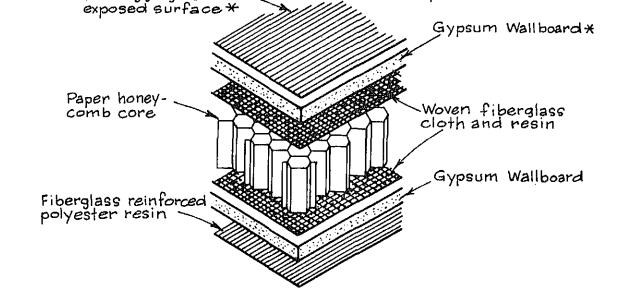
HONEYCOMB CORE PANEL WITH GYPSUM WALLBOARD FACING
